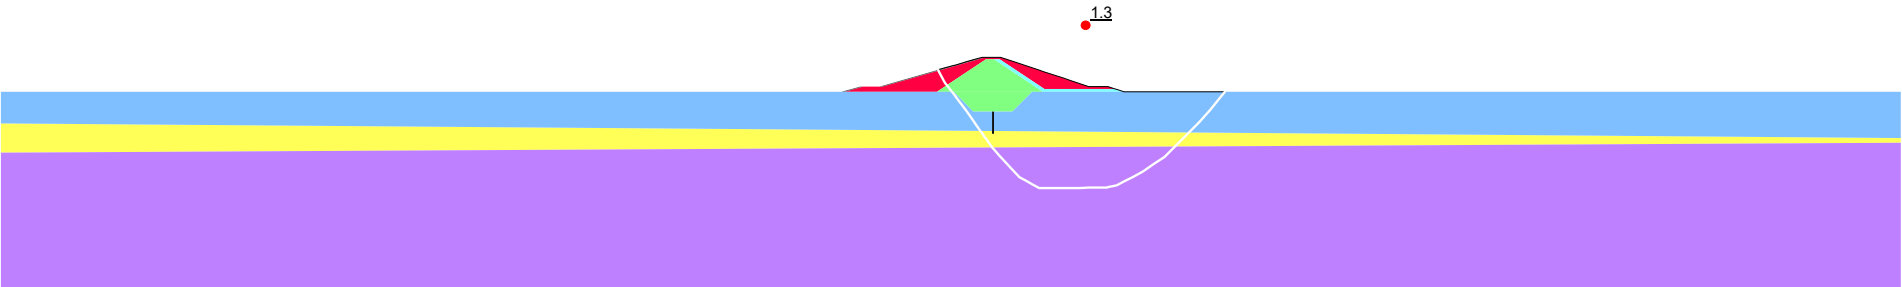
Alternative 2 End of Construction Downstream Factor of Safety— Birch
